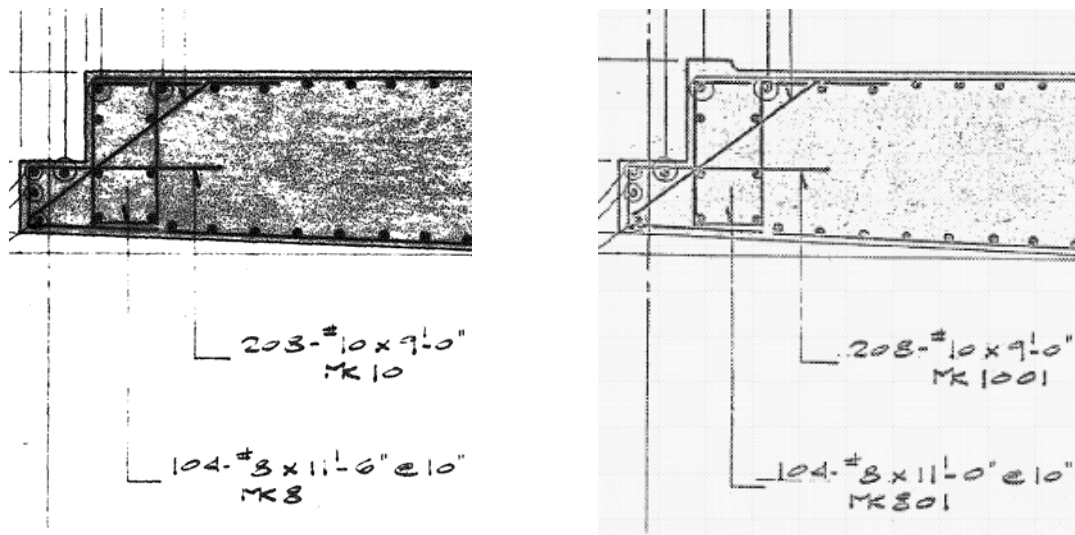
Details of #8 hanger reinforcement on the East side cantilever.
